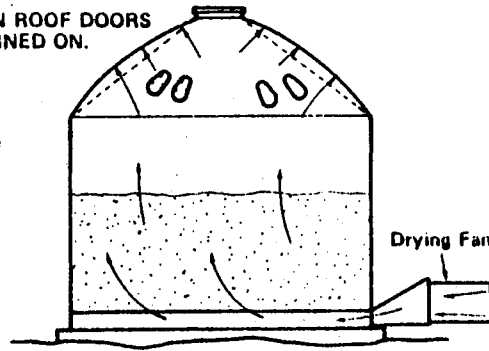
Bin failure due to inadequate roof openings for air outlet.
